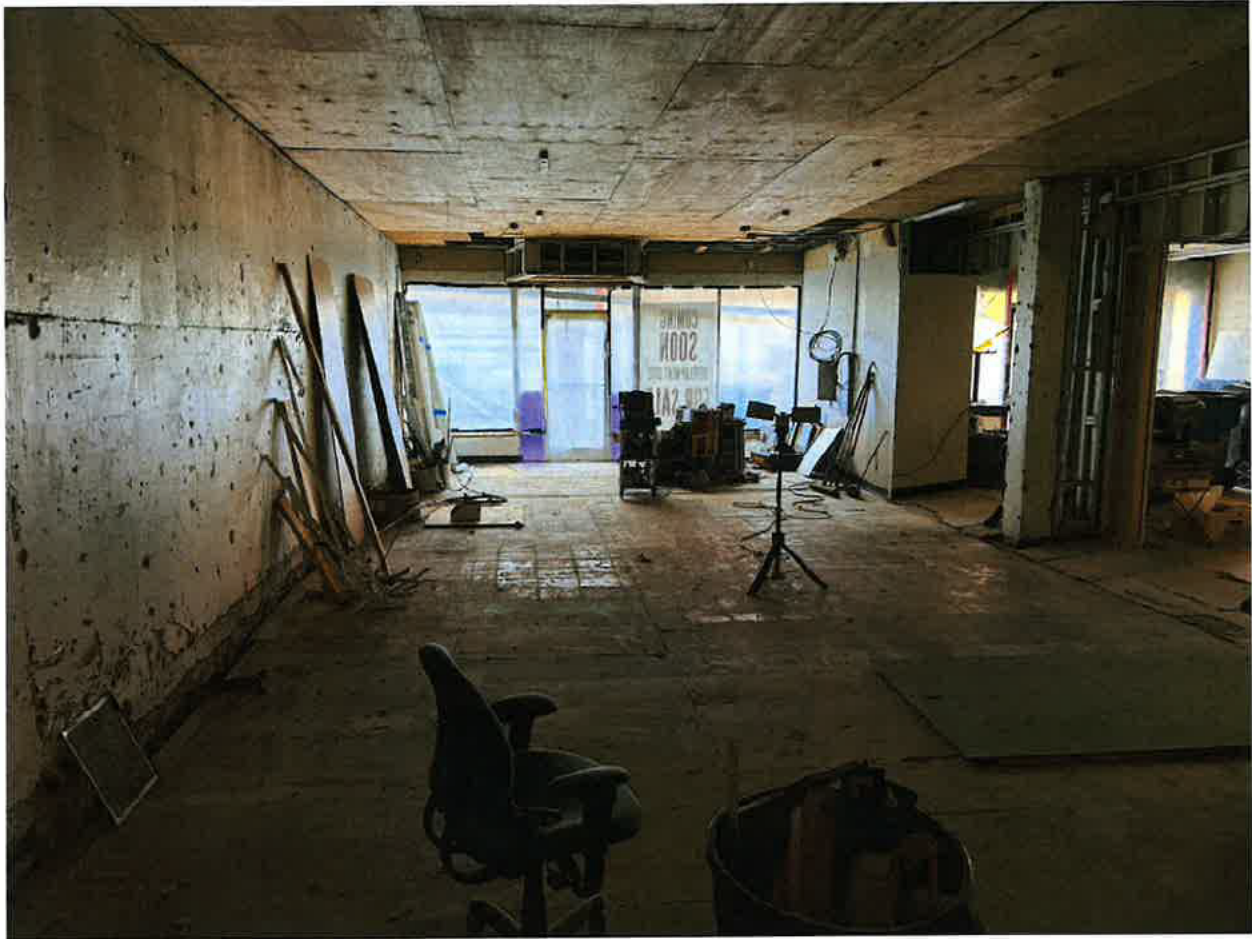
209 S Wilmington Raleigh, NC (03/19/2026) 1st floor, Interior Facing West. In addition to the original storefront, much of the first-floor framing has been replaced and none of the original flooring remains.
